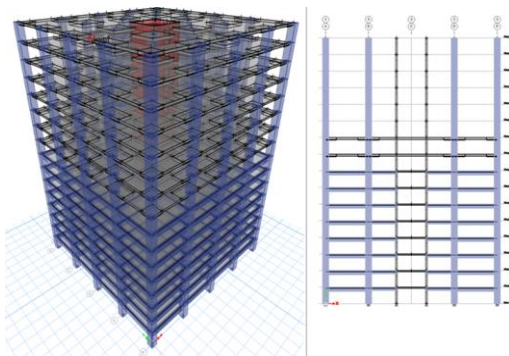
3D View and Elevation G+15[8B8FWDC]
